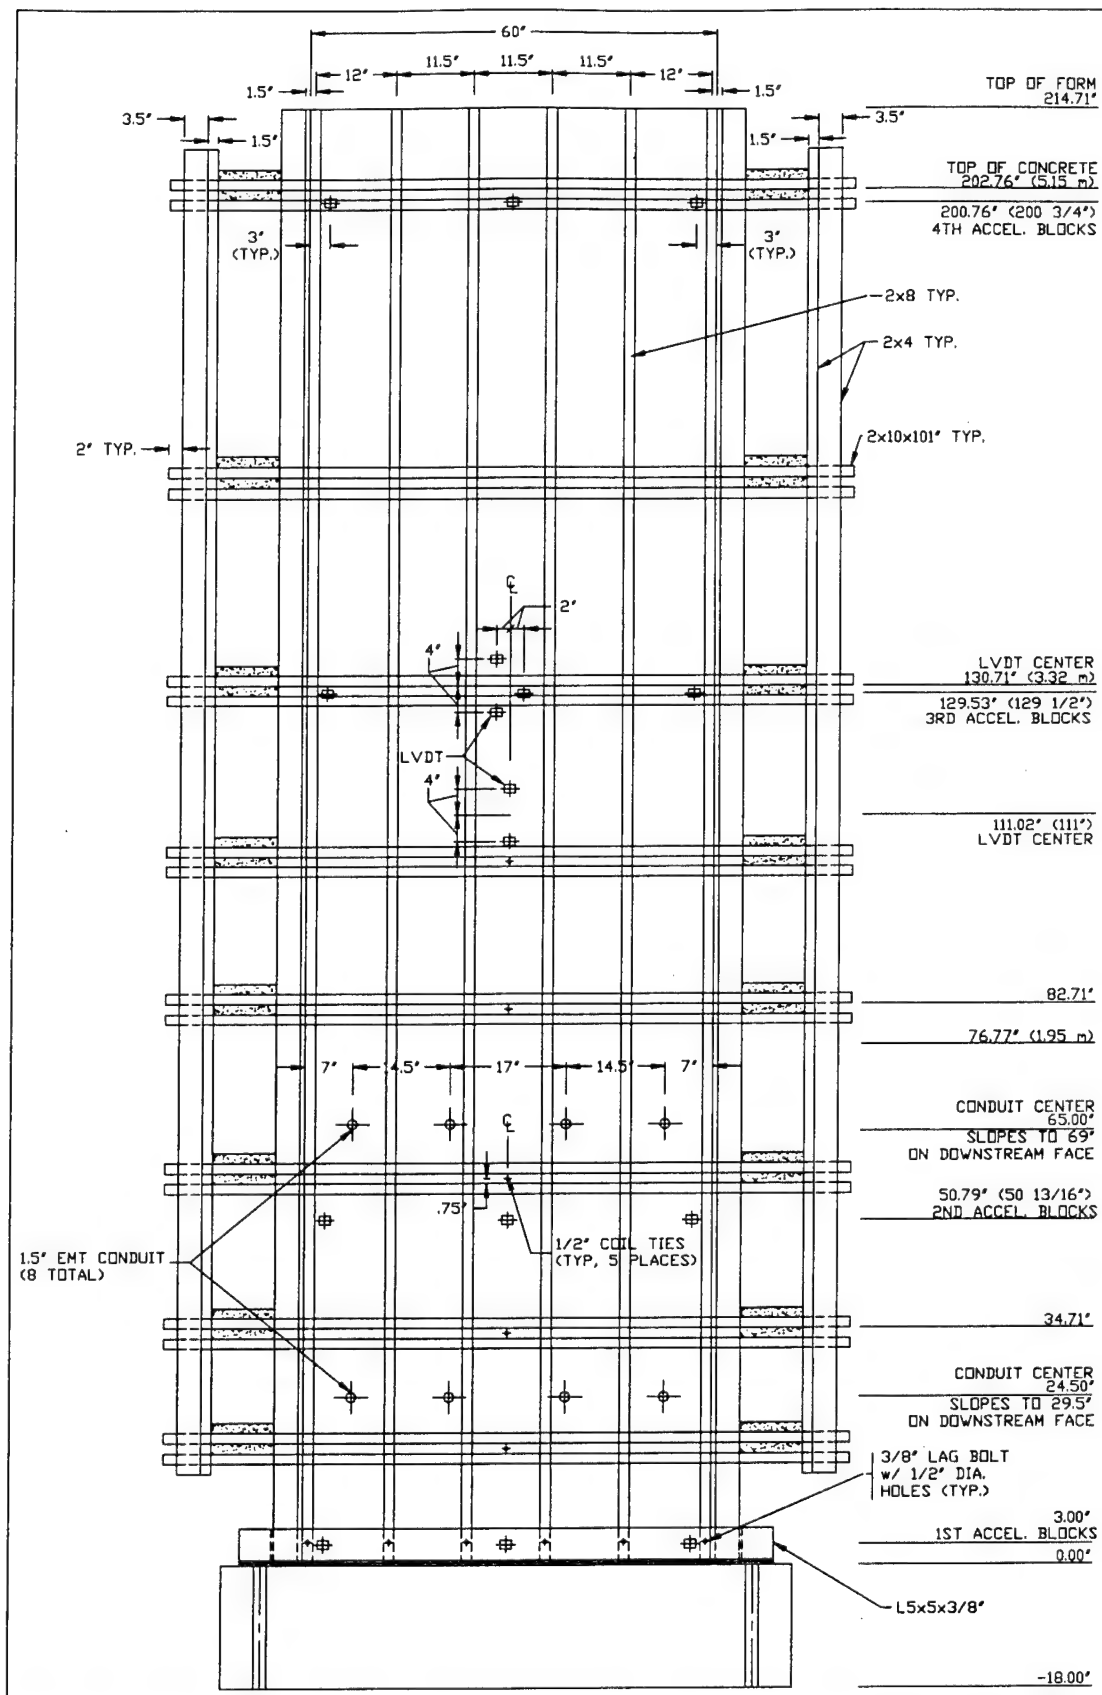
Upstream face formwork showing the walers, corners, and the location of ties, EMT conduit, and instrumentation plates.
